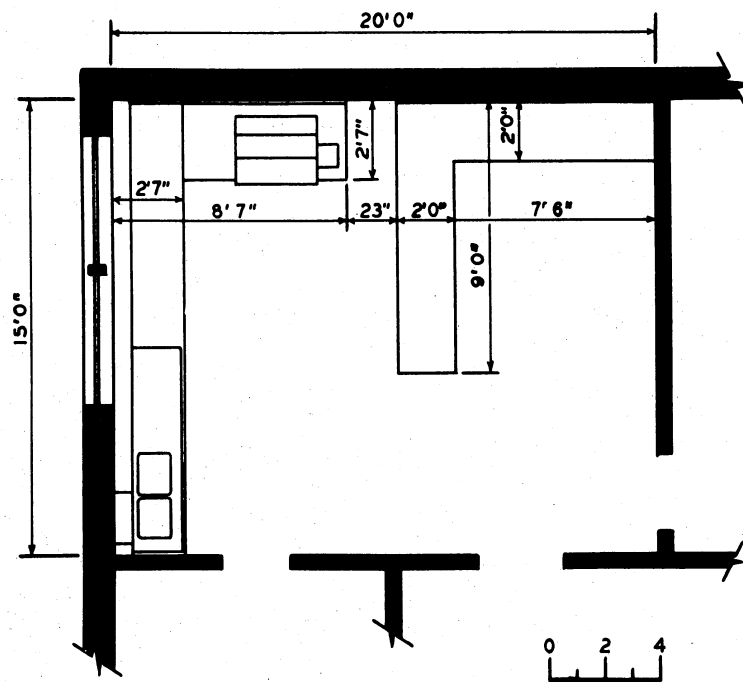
Plan view of typical one-room radioisotope tracer laboratory (Courtesy of Kewaunee Mfg. Co., Adrian, Mich.)
